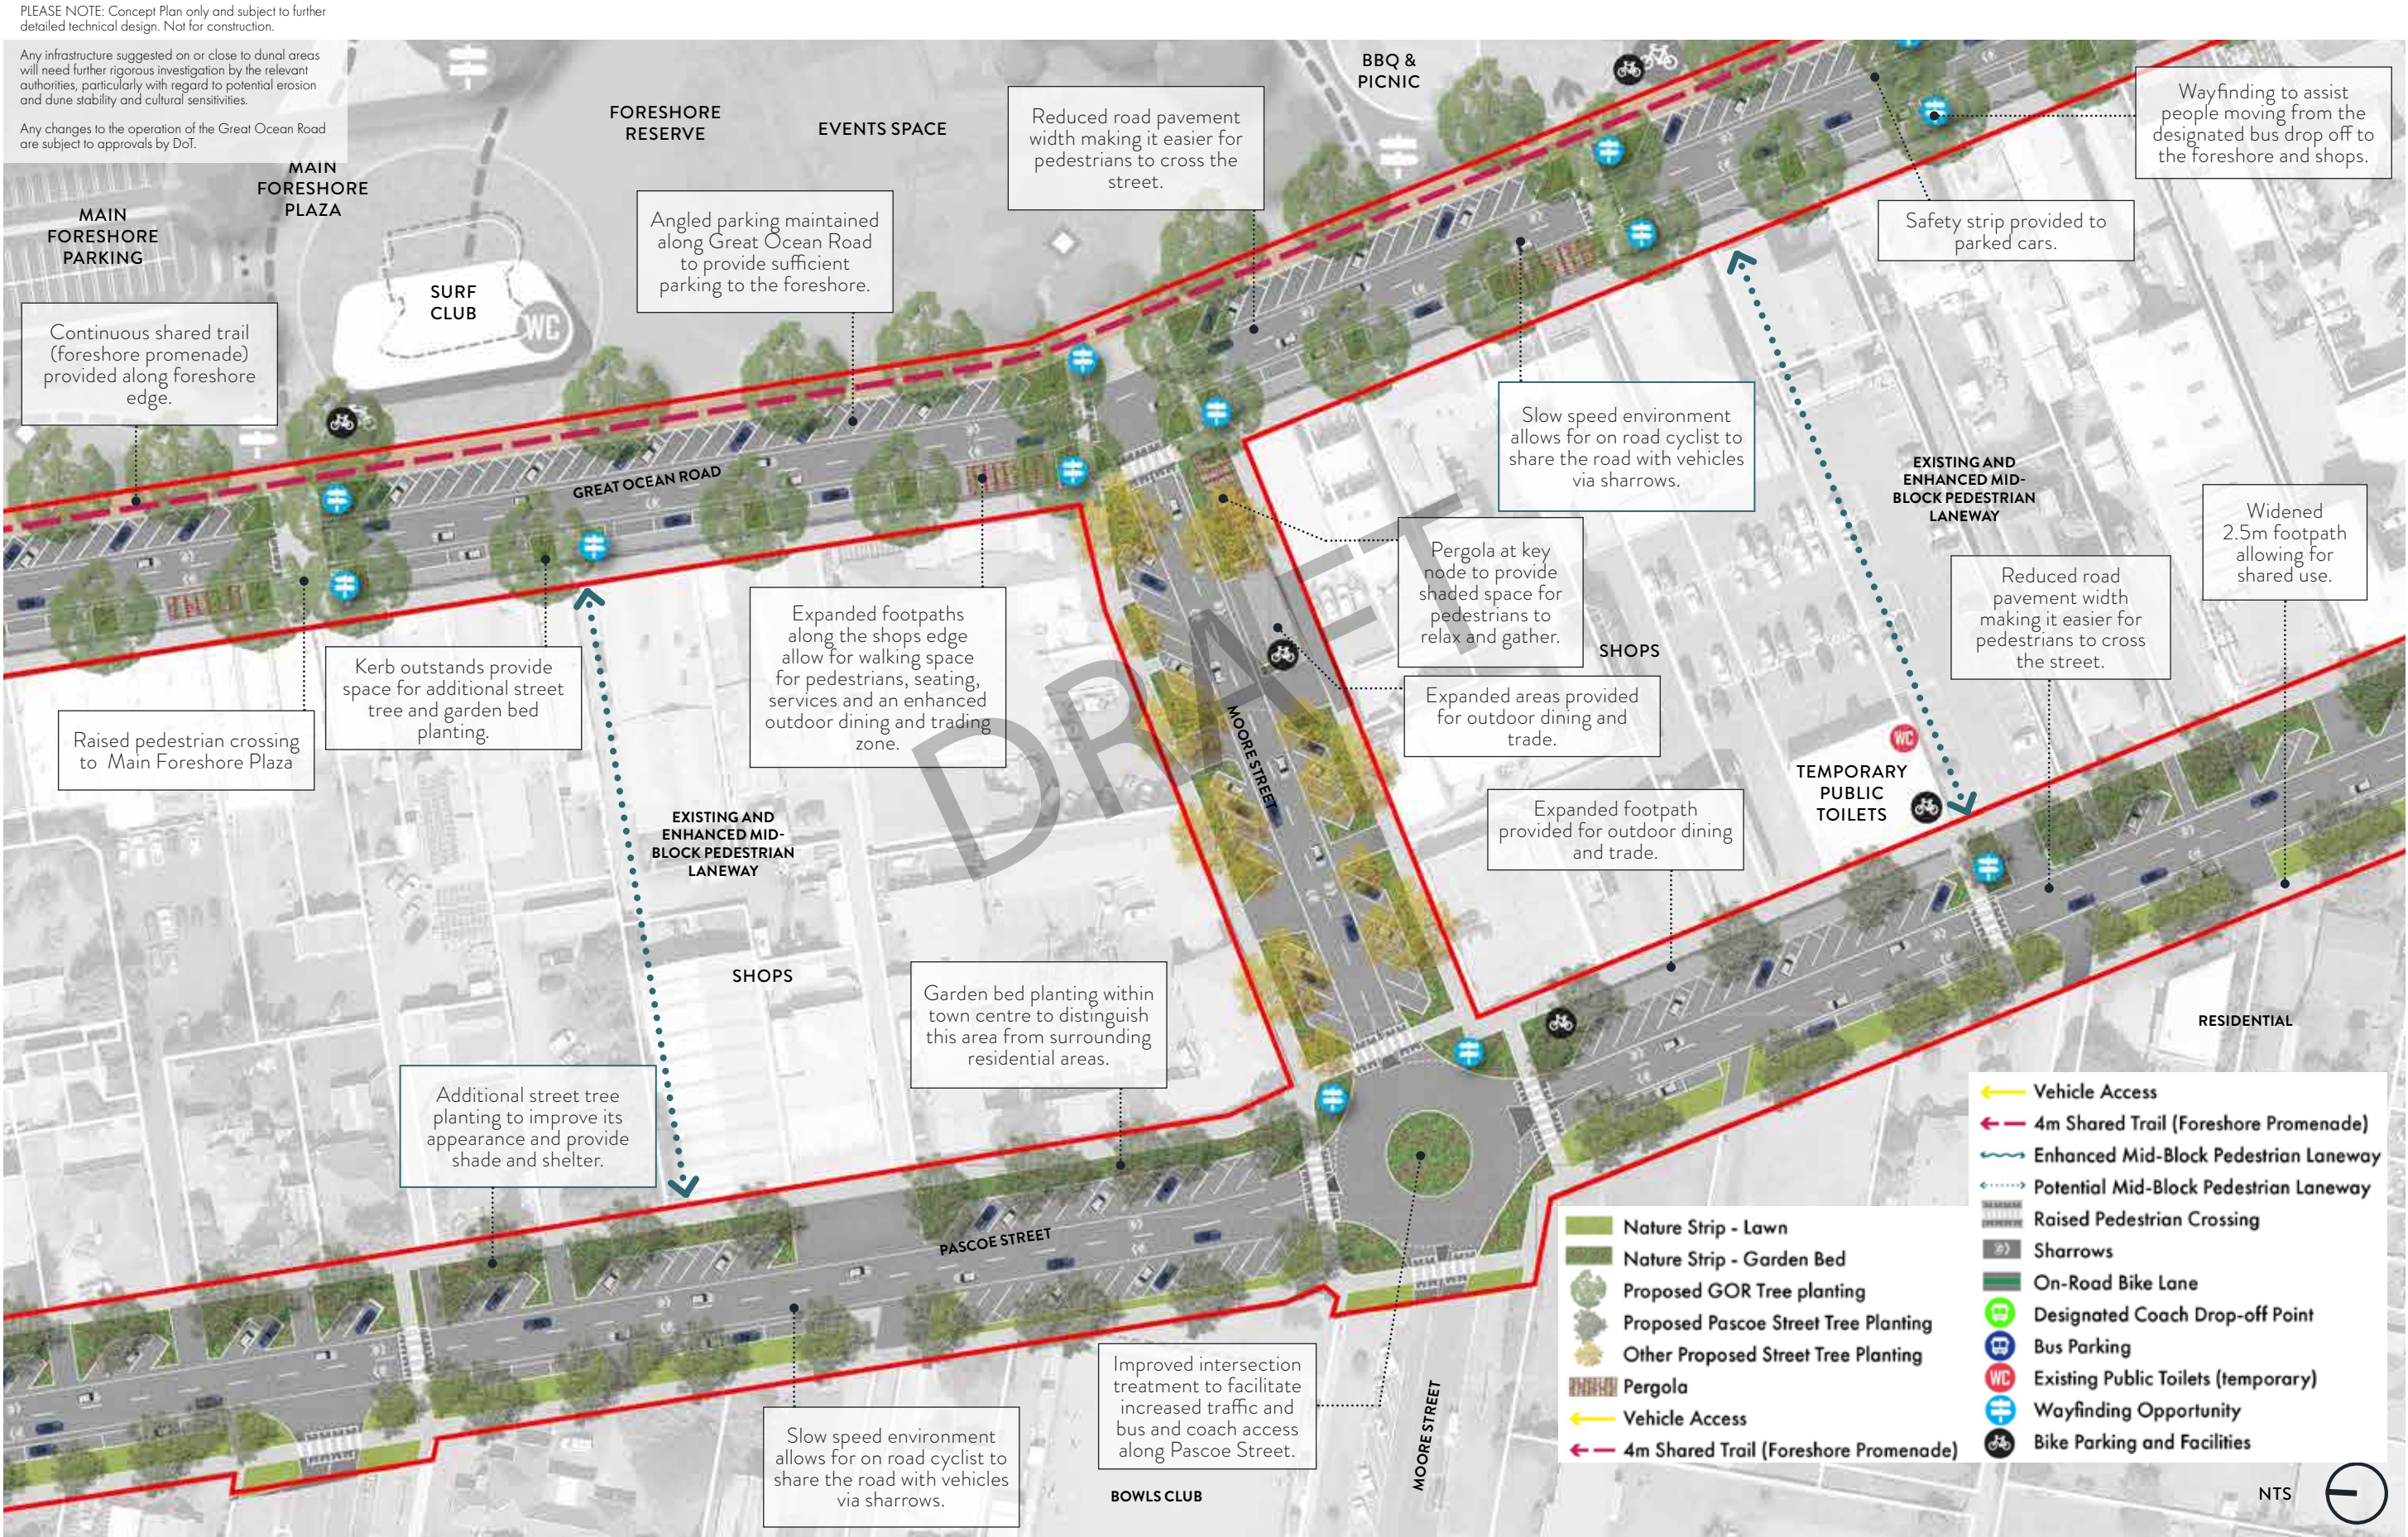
Detailed Streetscape Plan 2 - Option 2 - Two-Way
